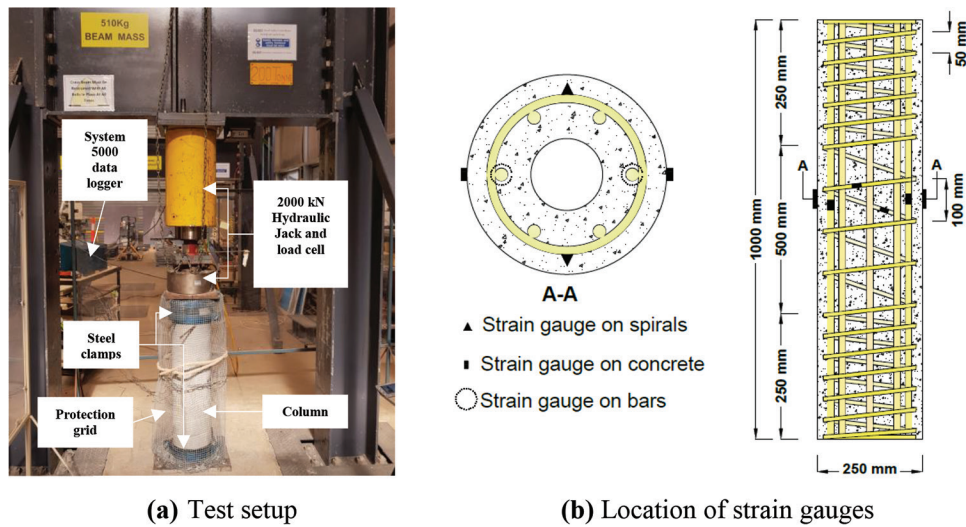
Test setup and instrumentation for GFRP-reinforced hollow concrete columns.
